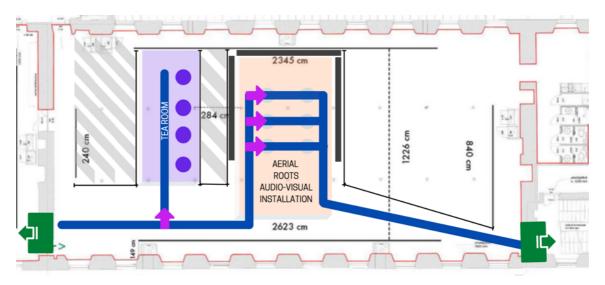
"Aerial Roots (Habitat)" Initial Installation Plan for Room Two
